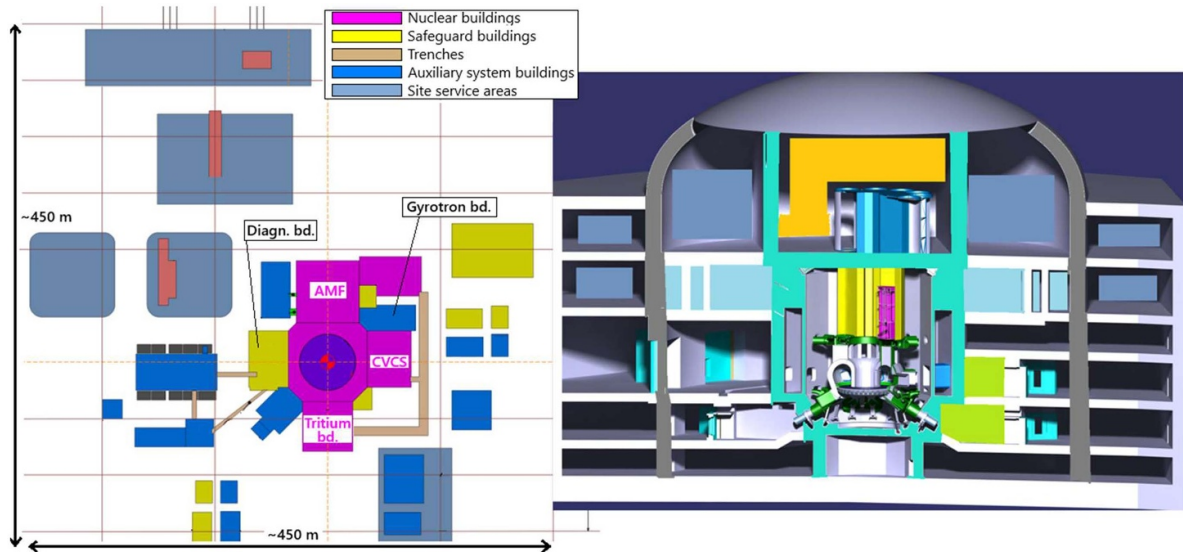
Left: VNS site with arrangement of nuclear buildings, buildings hosting tokamak auxiliary systems, and power supply and heat rejection installations, right: section of the left side of the tokamak building.
